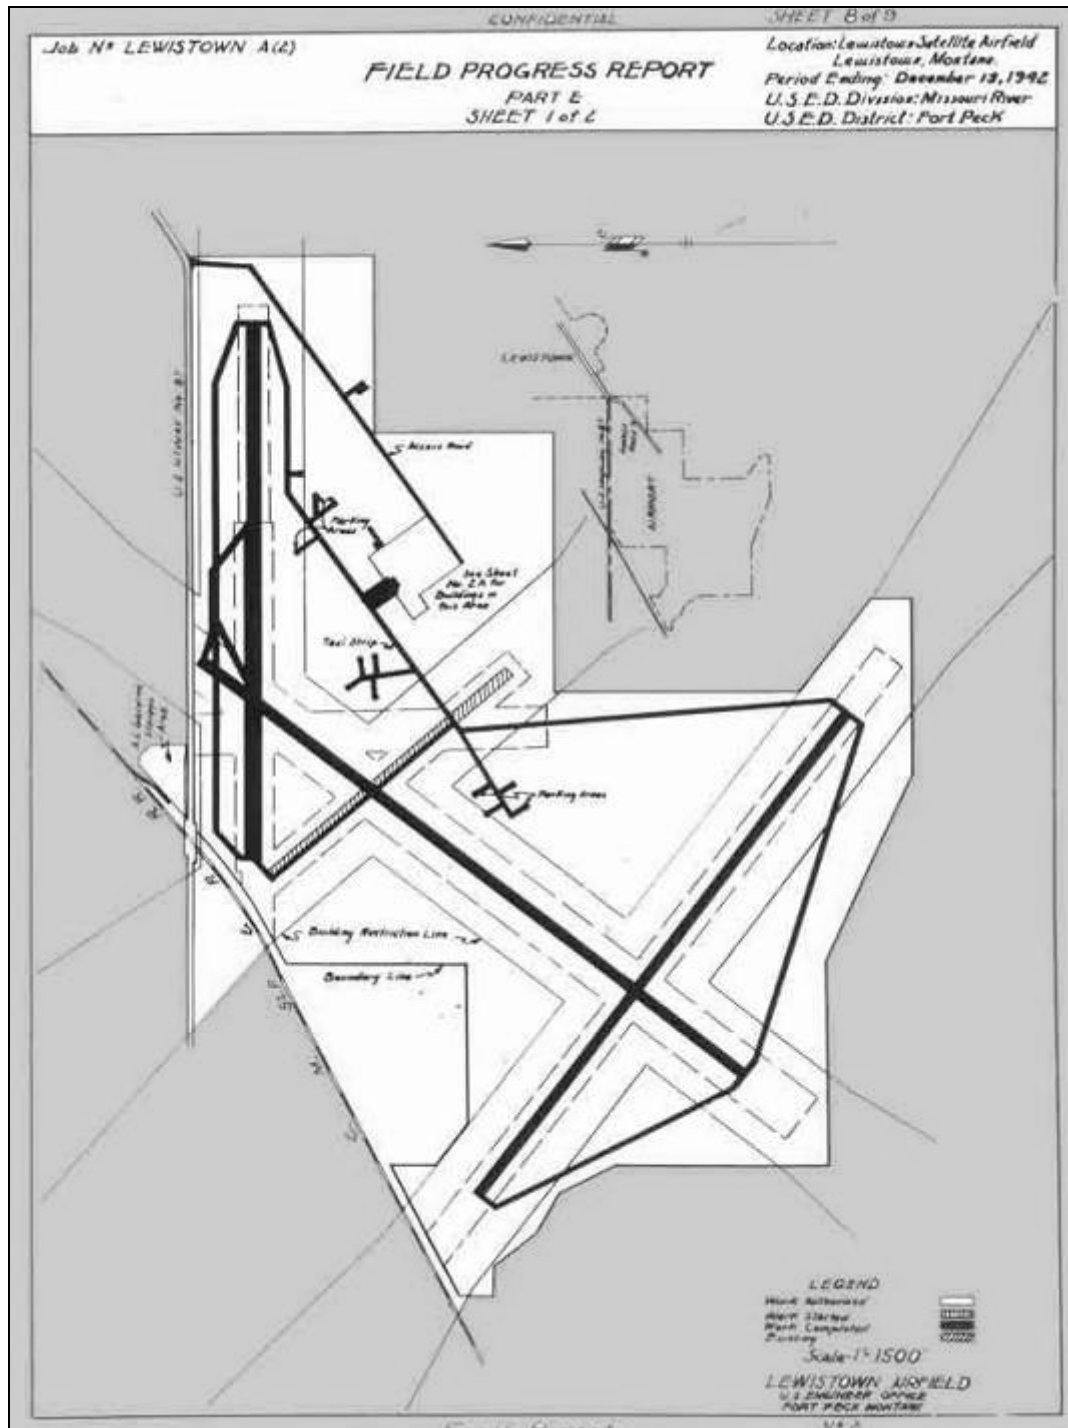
Original design plan of the Runway Complex at the Lewistown Airfield.
